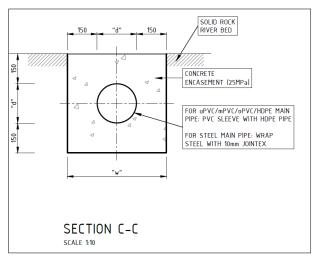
Section through a 'hard' watercourse crossing with pipe encased in concrete
